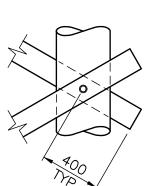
DETAIL - DIAGONAL CROSS BRACE AND WALE CONNECTION
